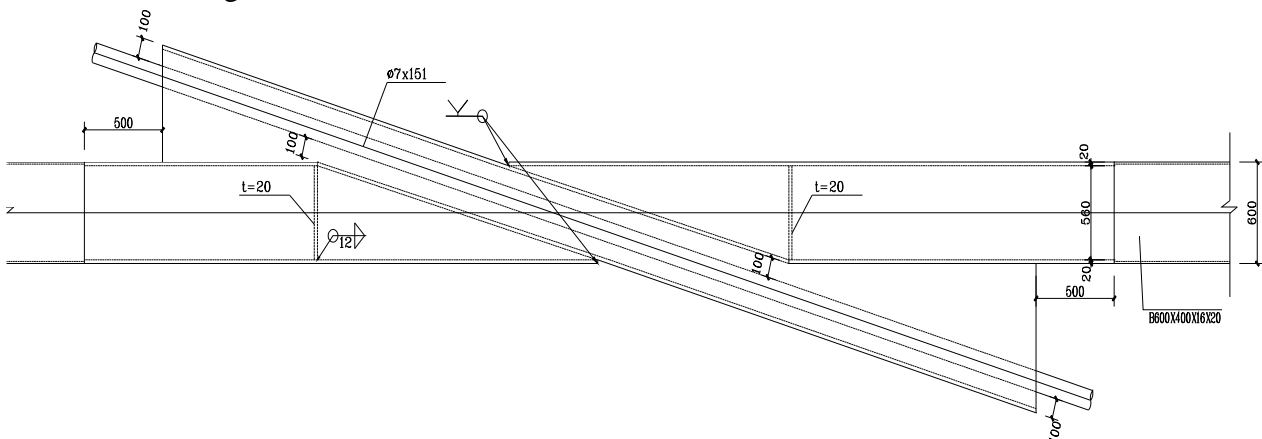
Diagonal Cable Penetrating Upper Steel Beam Joint
